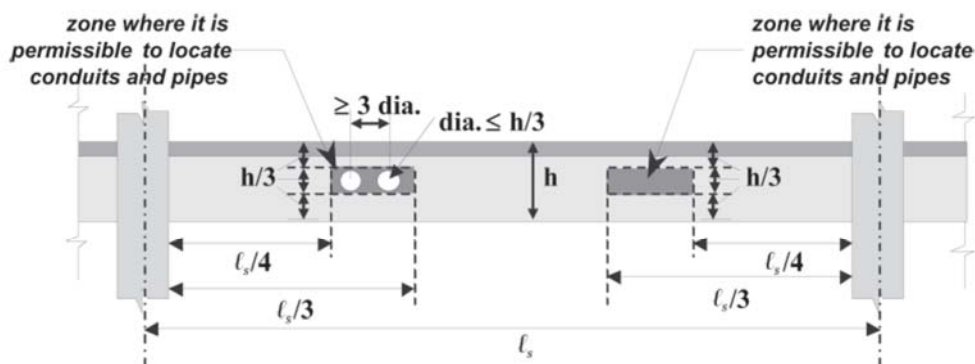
Location of conduits and pipes passing horizontally through girders, beams, and joists.
